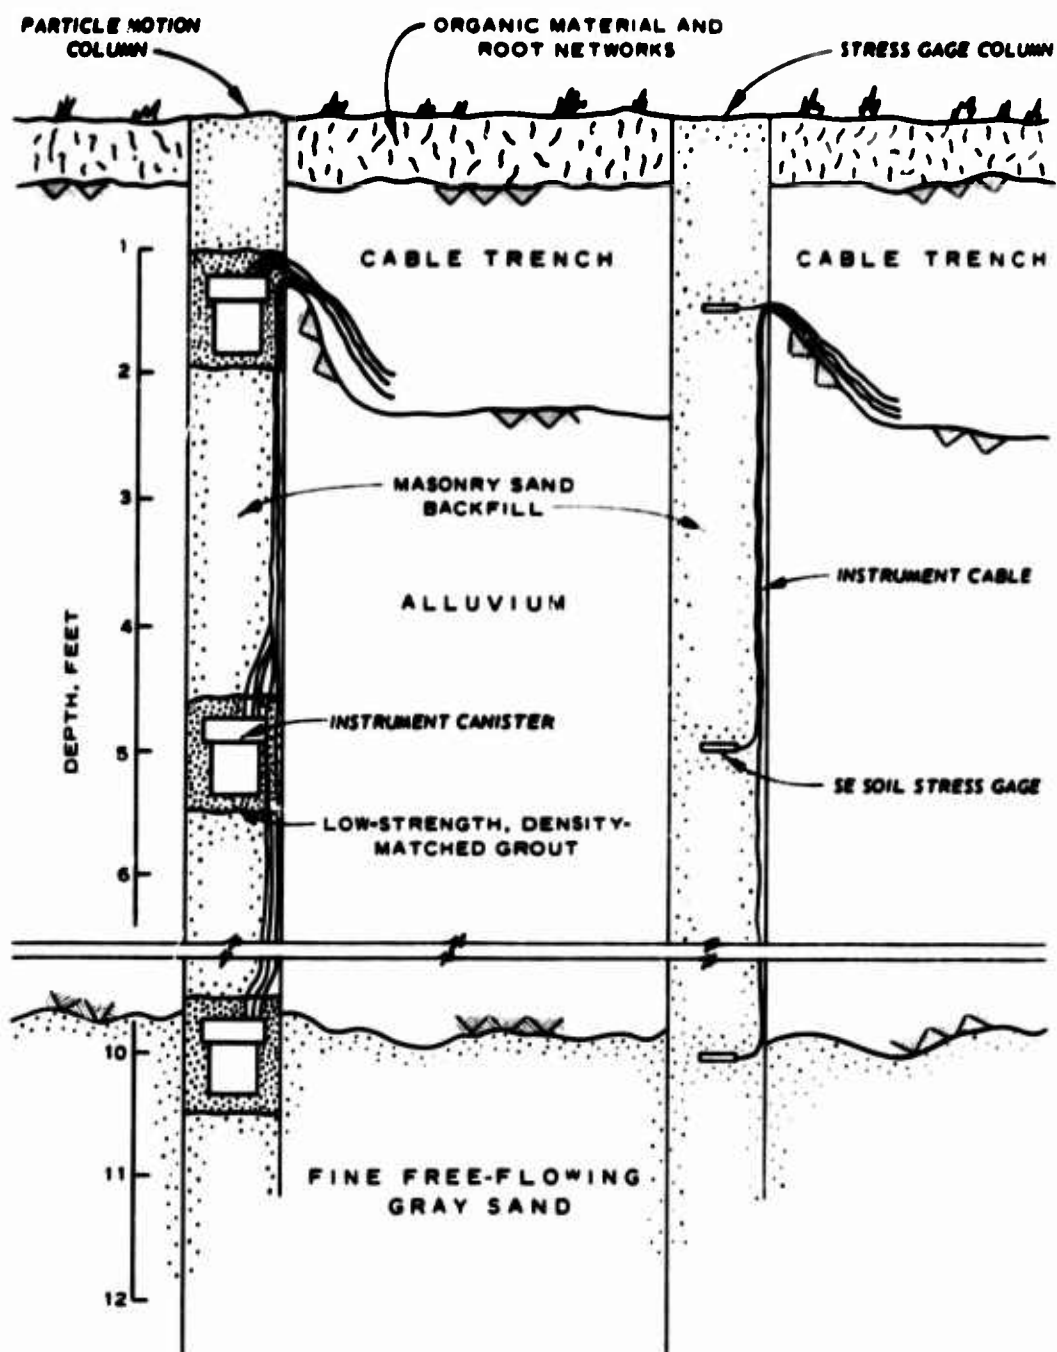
Typical gage columns, Drowning Ford Test Site.
